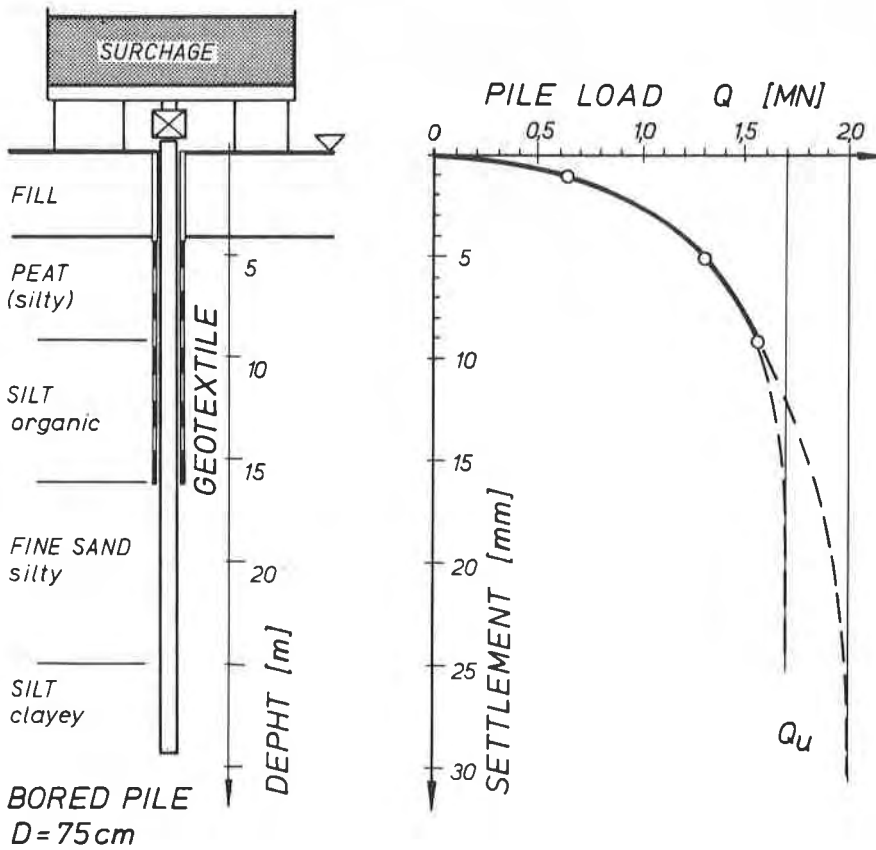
Load test on bored pile; reinforcement wrapped with stretchable non-woven geotextile within the peats and "liquid" silts.
